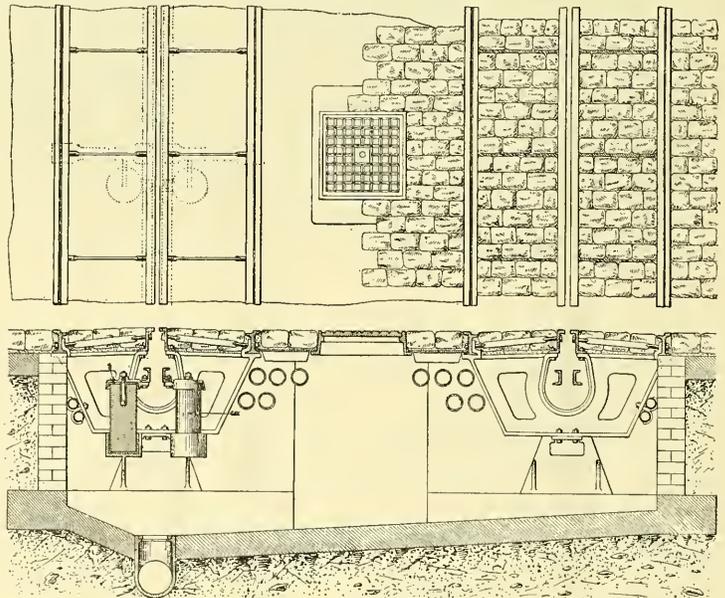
PLAN AND CROSS-SECTION OF TRACK CONSTRUCTION OF LENOX AVENUE CONDUIT RAILWAY.
